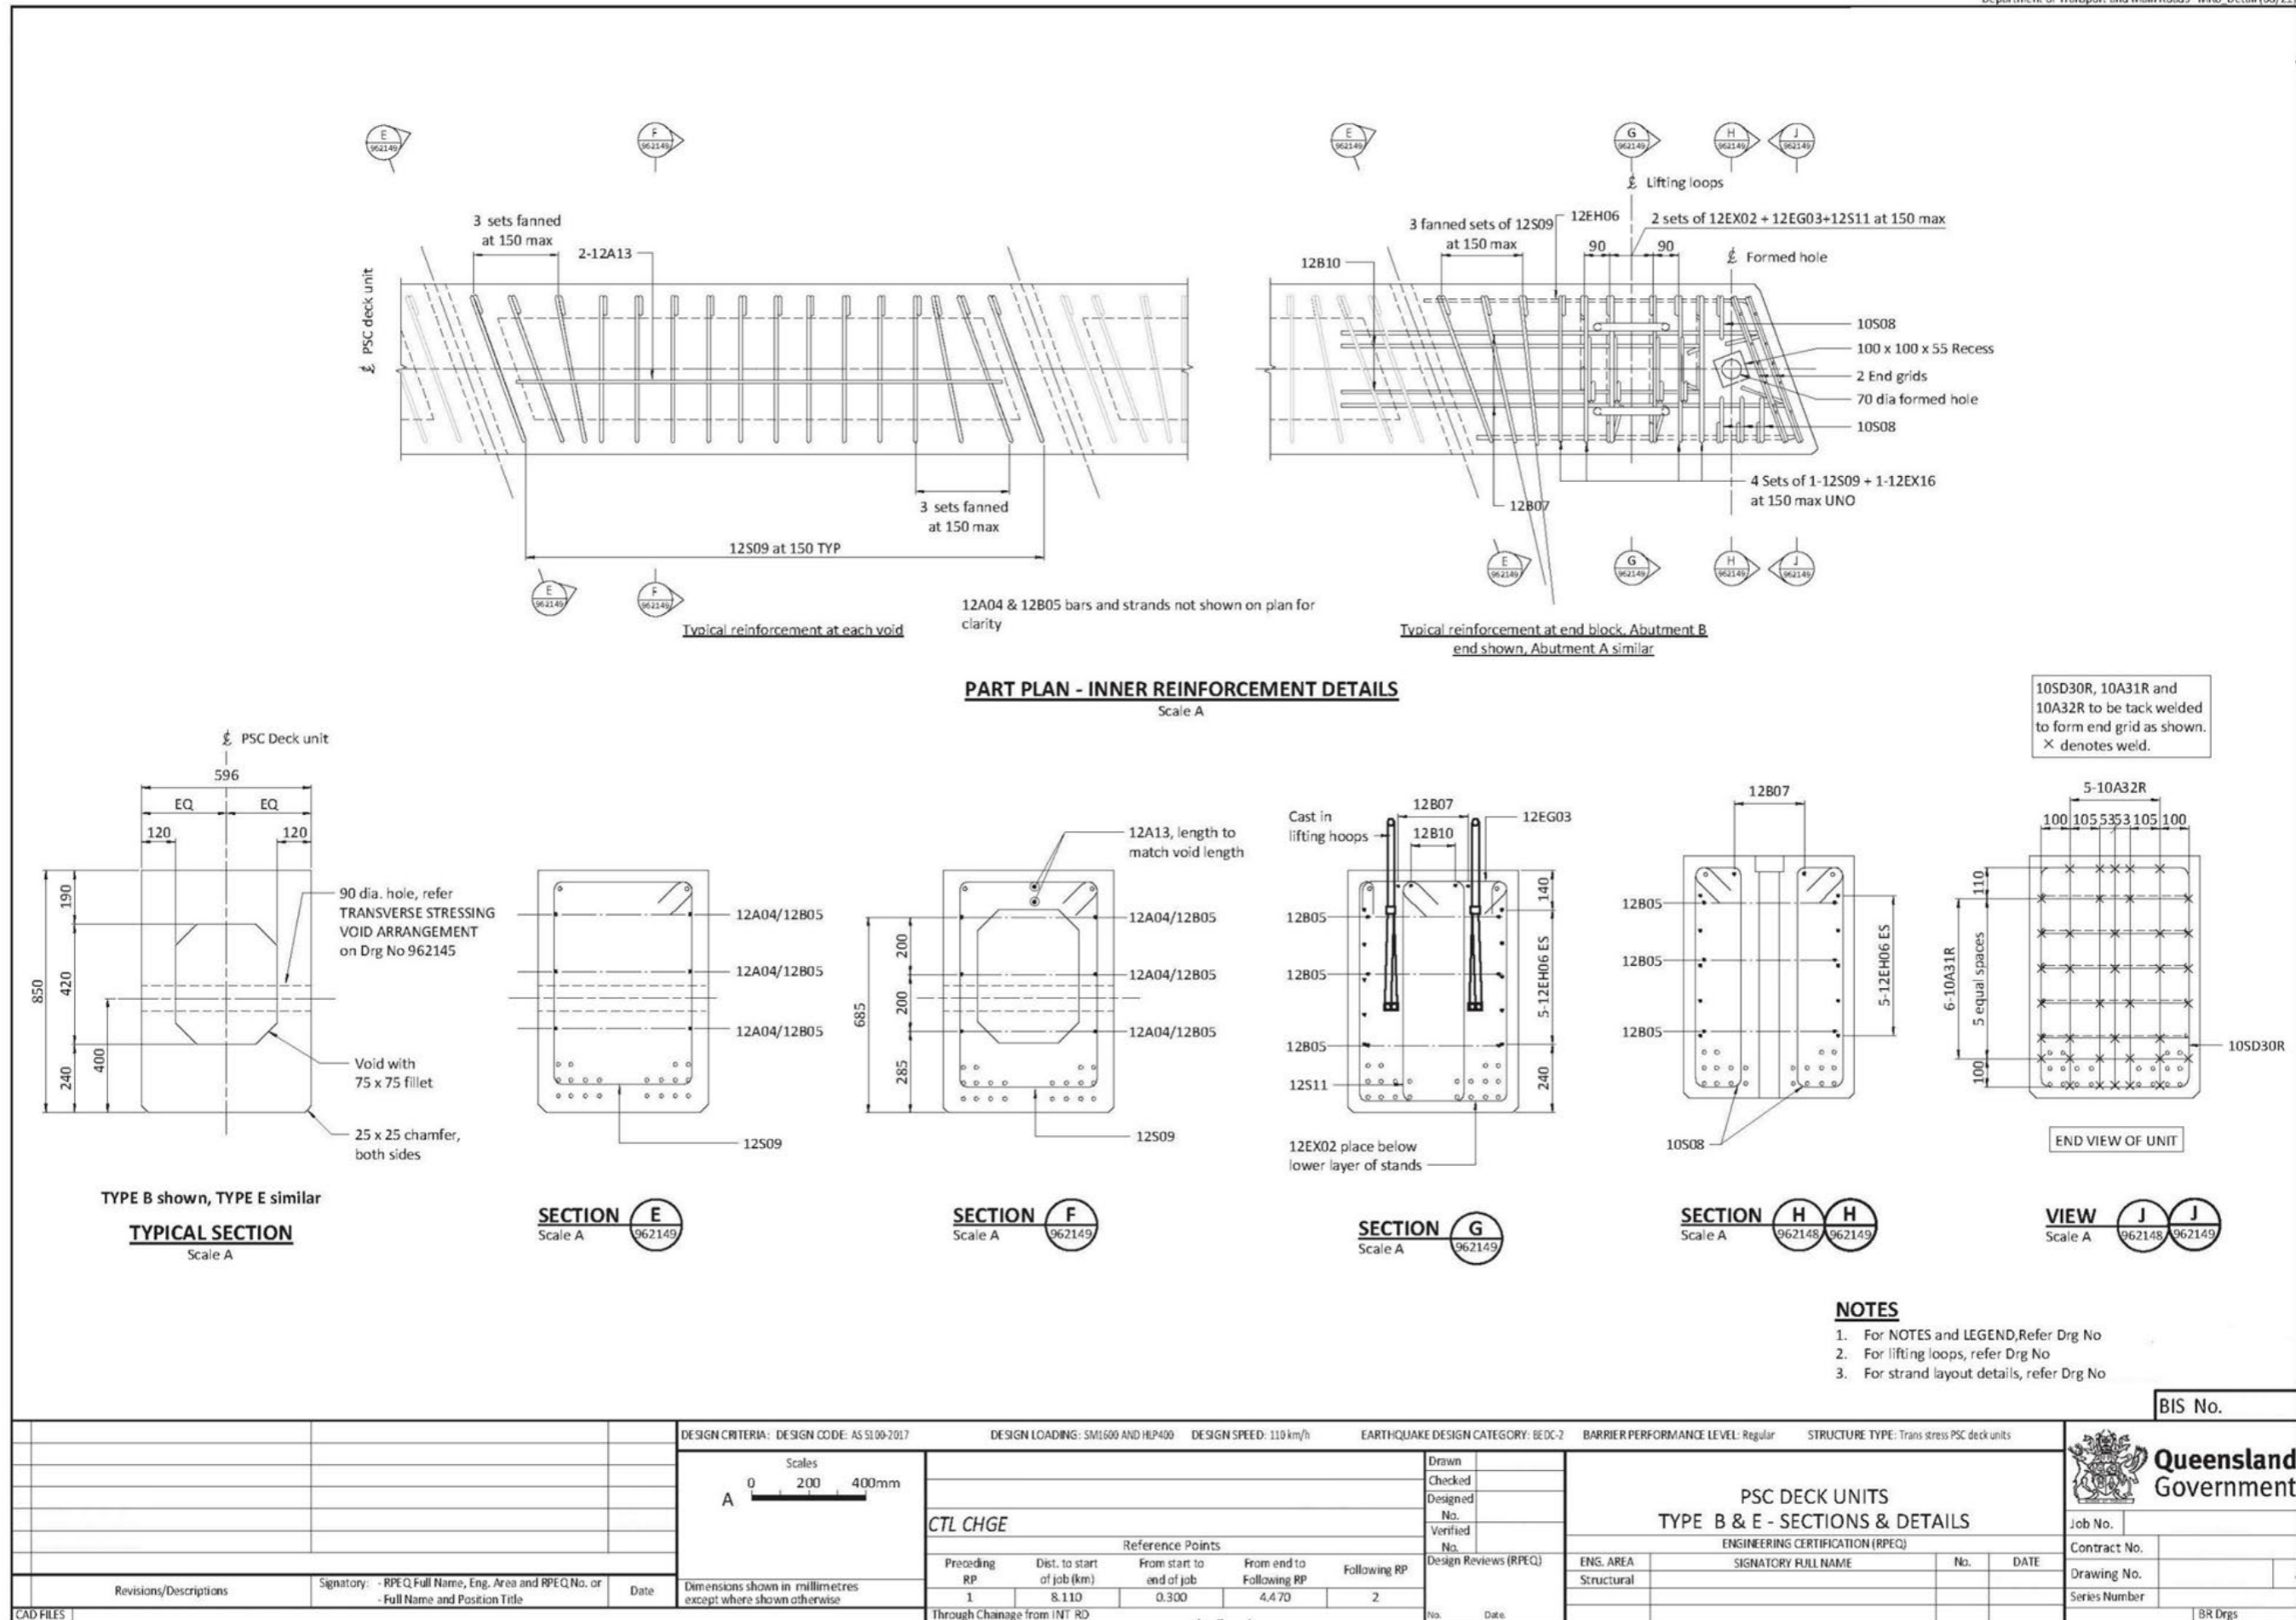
(f) - Example transversely stressed deck unit bridge drawings - Sheet 6
